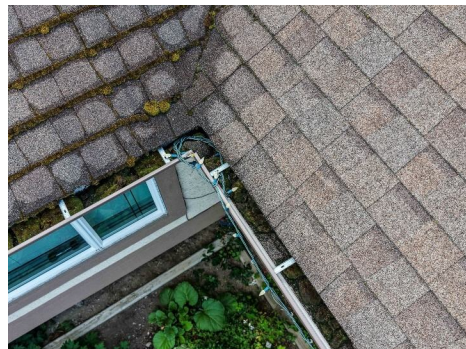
Detail 7 — Drainage / Gutters and Downspouts, North.
